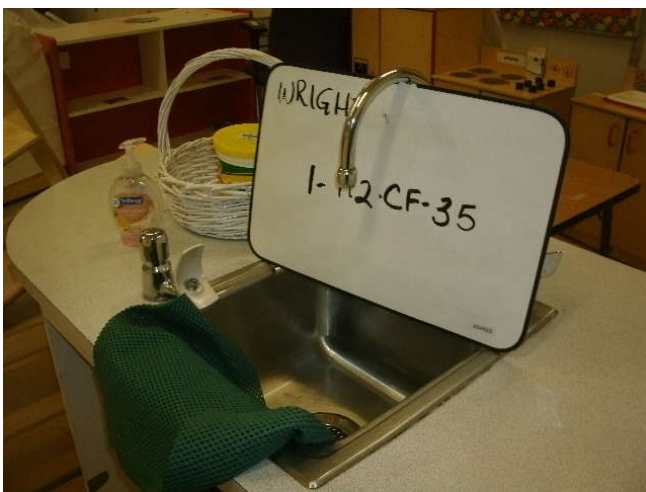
Classroom faucet w/bubbler, located on the 1st floor, in room 112.
